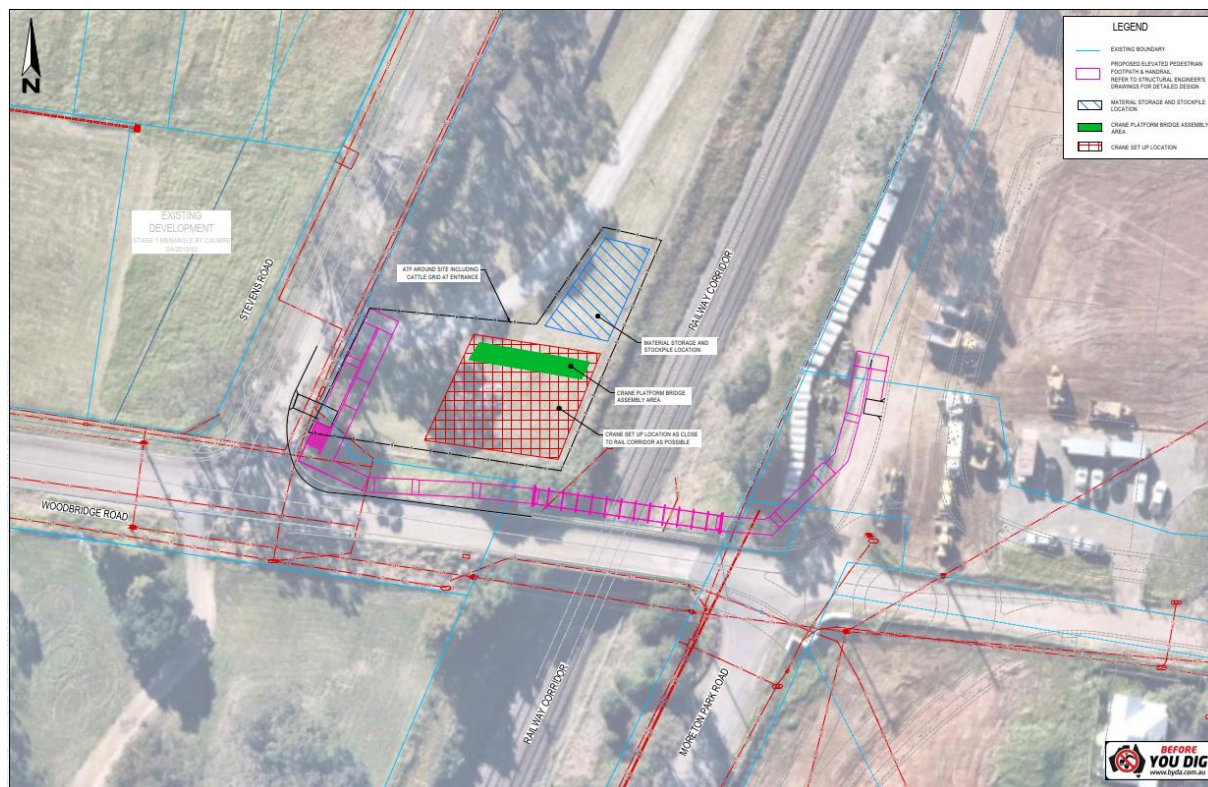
Site work areas – Detail (source: Christie Civil, Egis, 2023)
